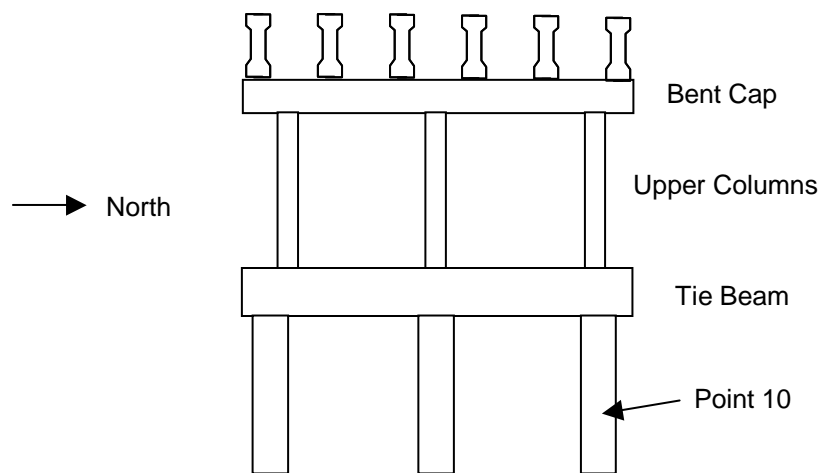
Schematic drawing of crack-measurement location on Bent 11
